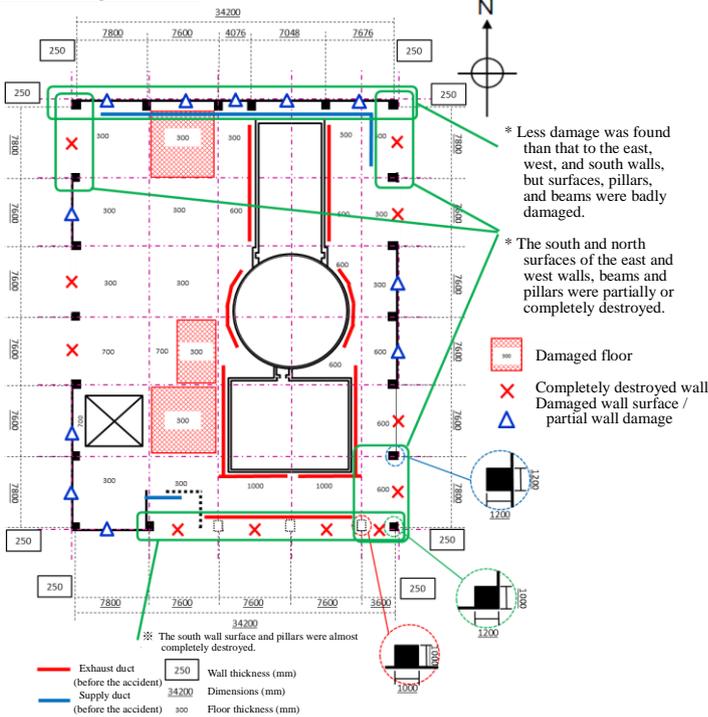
Traces of Damages on the Reactor Building (floor, ceiling, and walls)
